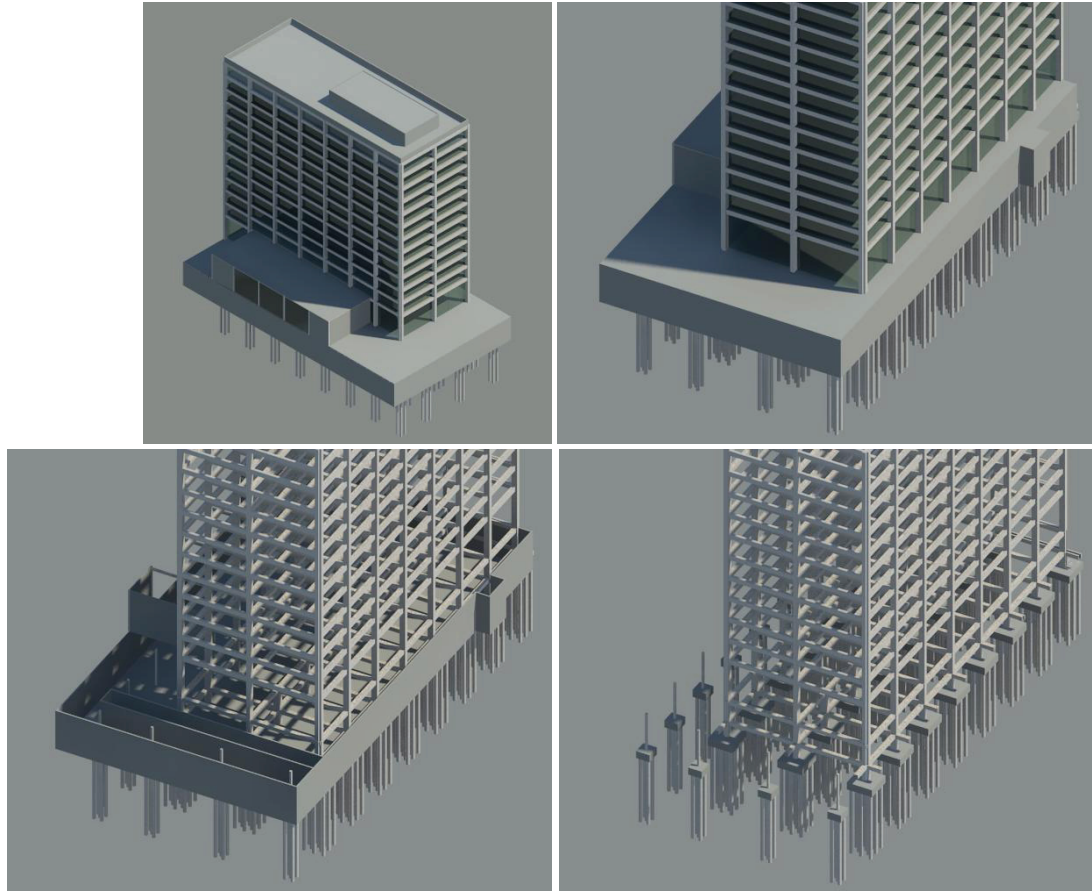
Renderings of the Sherman Oaks building, including cut-away views showing structural details in the first story, basement, and foundation regions.
